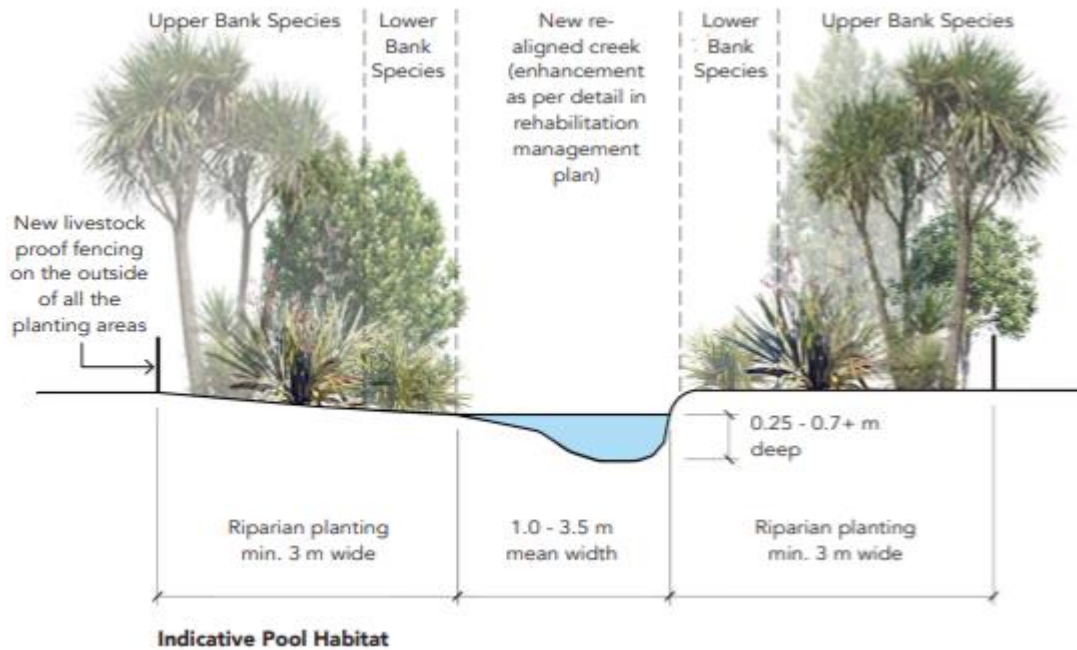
Reconstructed Creek Cross Section showing Riparian Planting
